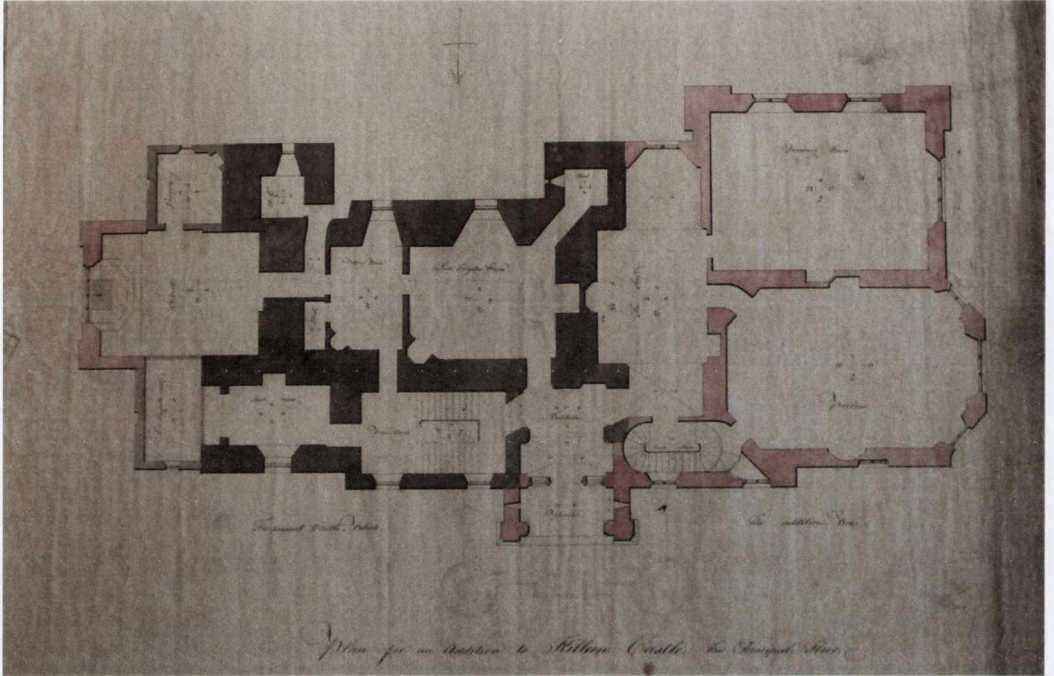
Killeen Castle, proposal second scheme, principal floor plan, Francis Johnston, Feb. 1803, IAA, RIAI Murray Collection, 92/46.910, courtesy of the Irish Architectural Archive.
